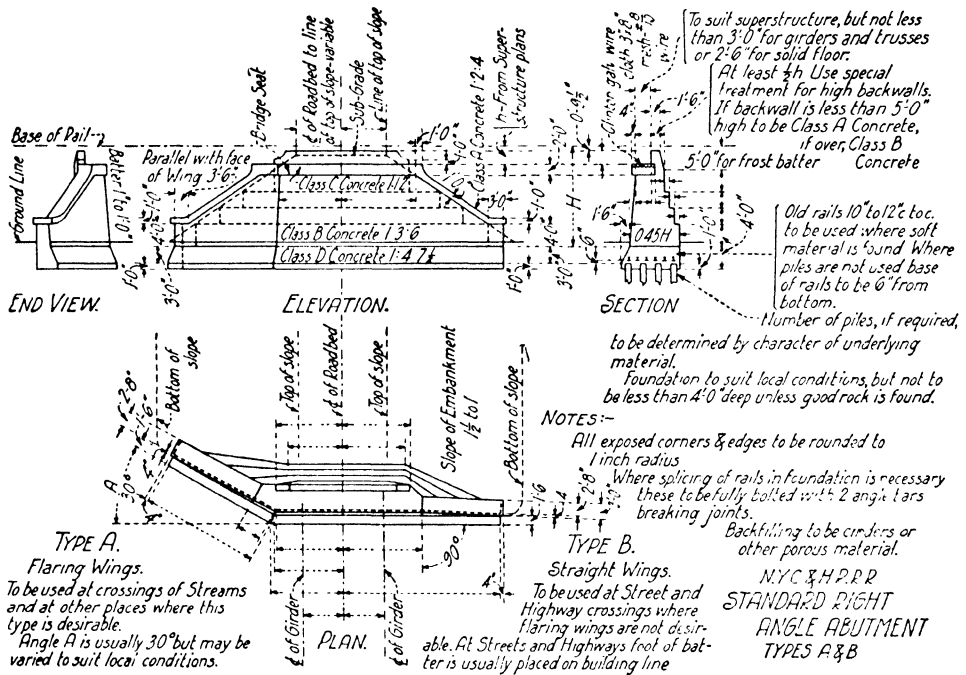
MASONRY ABUTMENTS, N. Y. C. & H. R. R. R.
